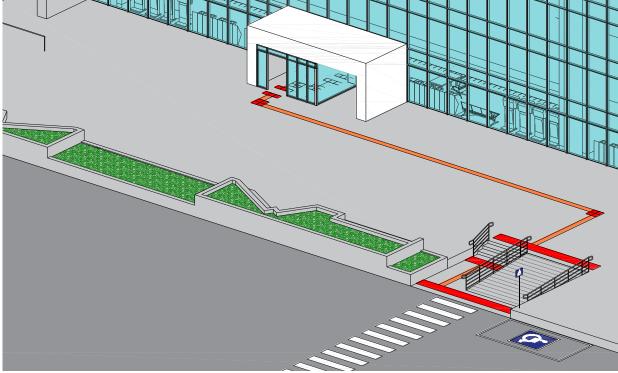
Example of an accessible approach with ramp and stairs connecting the drop off zone to entry gate
